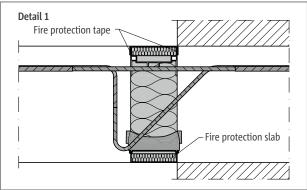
Schöck Isokorb® T type K for REI120: Detail 1
